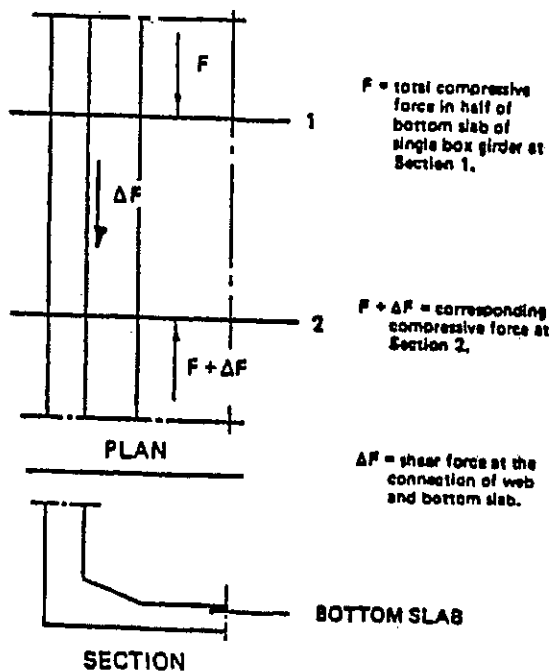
Longitudinal shear transfer by bottom slab to web haunches
